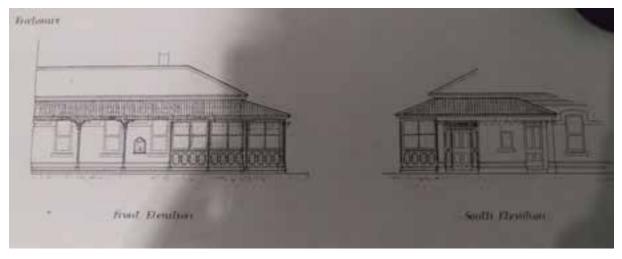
1887 drawings of the facade (left) and south elevation fronting Hobson Street (right), showing the proposed new verandah construction and new 'public room' to the corner, to be built under the same roofline (Saleta 2016).
